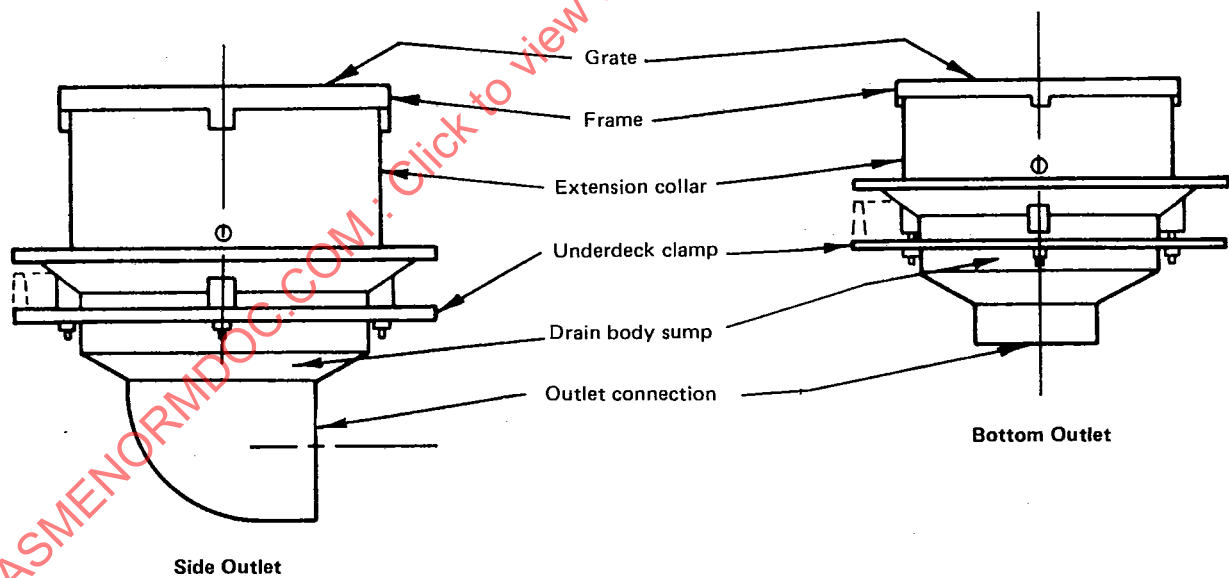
PROMENADE OR DECK ROOF DRAIN
